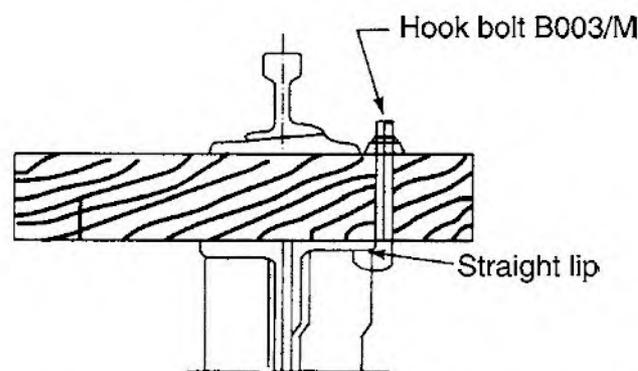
Method of fastening wooden sleepers on plate girder spans
